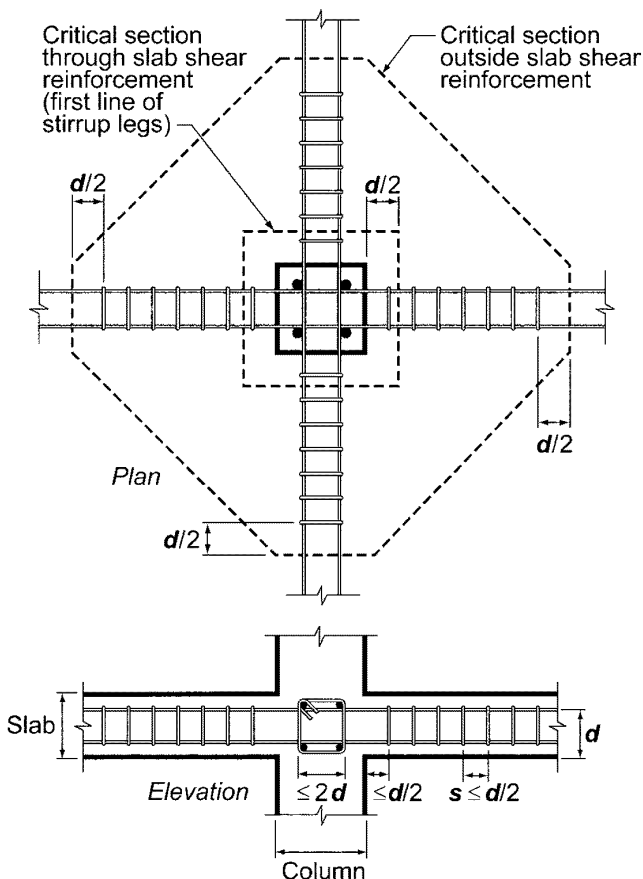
Arrangement of stirrup shear reinforcement, interior column.
